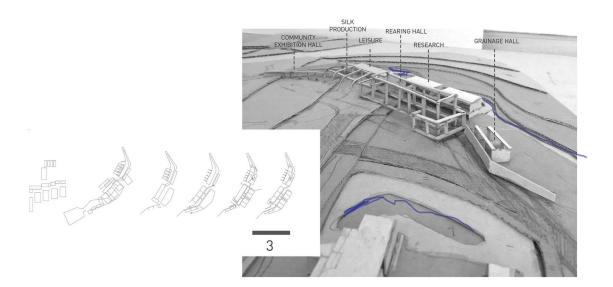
Ground floor planning for Iteration 2. (Author, 2016)
